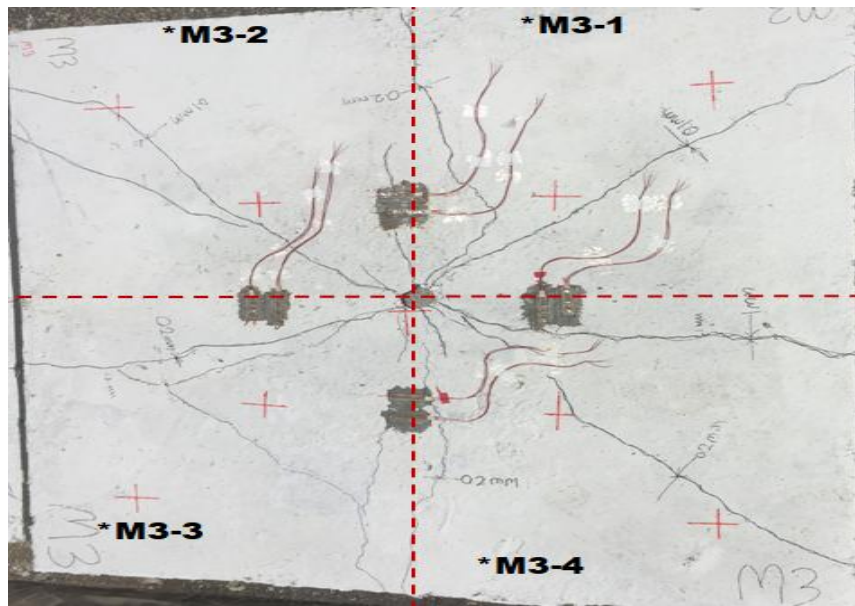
Failure for Slab Specimen M3 (2m drop) – another plan view
